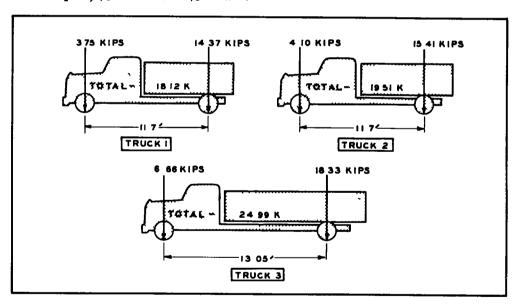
Loading diagram of three county maintenance trucks used for controlled loading tests on Fennville Bridge.
